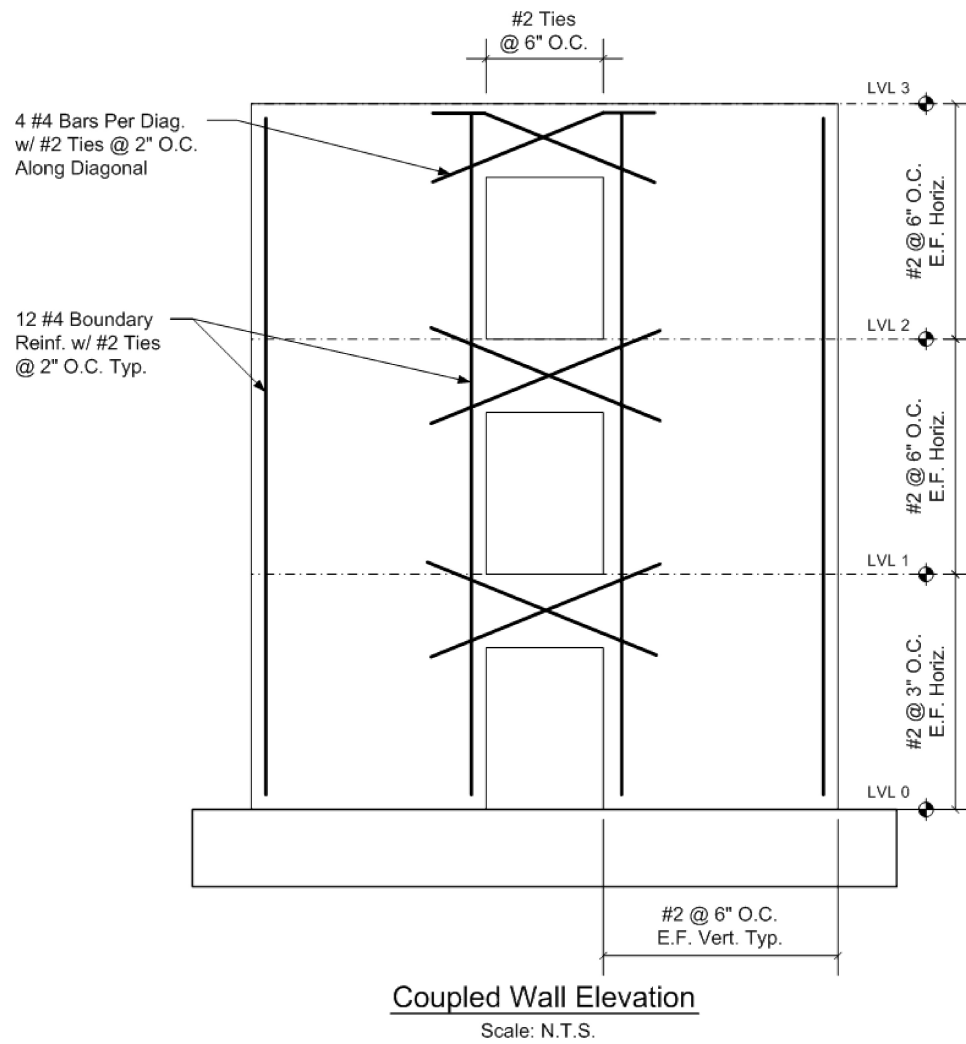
Coupled Wall Reinforcement from Plastic Design
